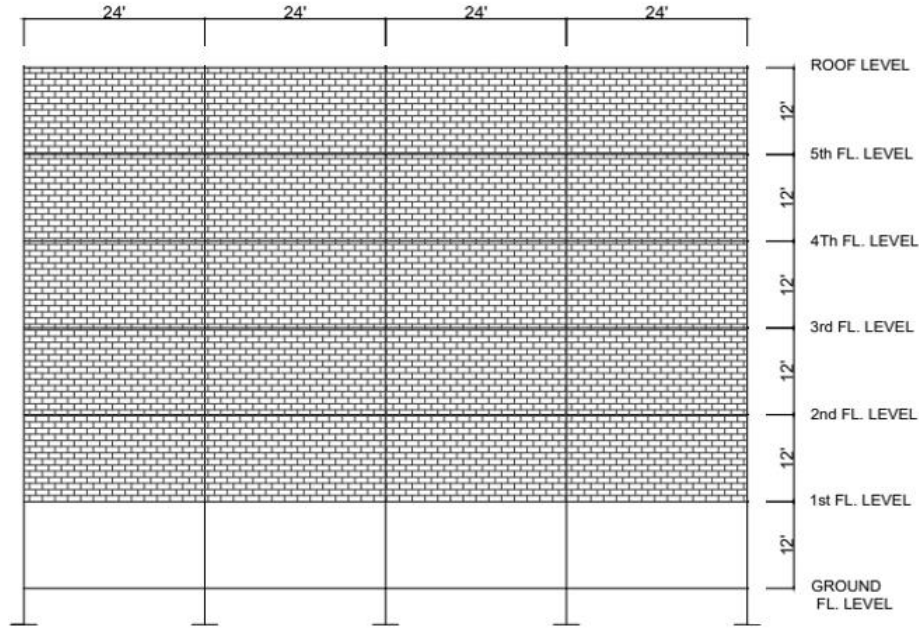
Structural elevation of the building* [NED and GHI, 2012]
